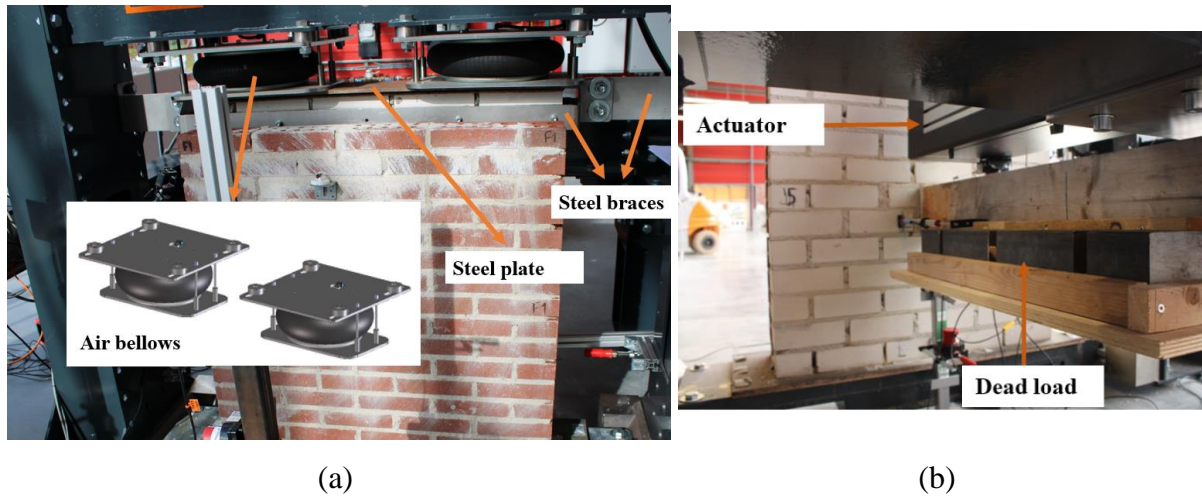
Test setup: Air bellows, steel plate and braces details (a); detail of actuator and dead load (b).
